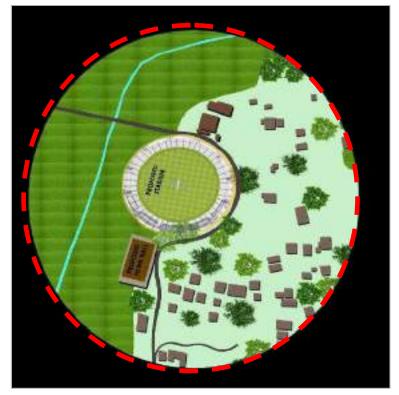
Proposed stadium and Town hall at Kadakkadu
